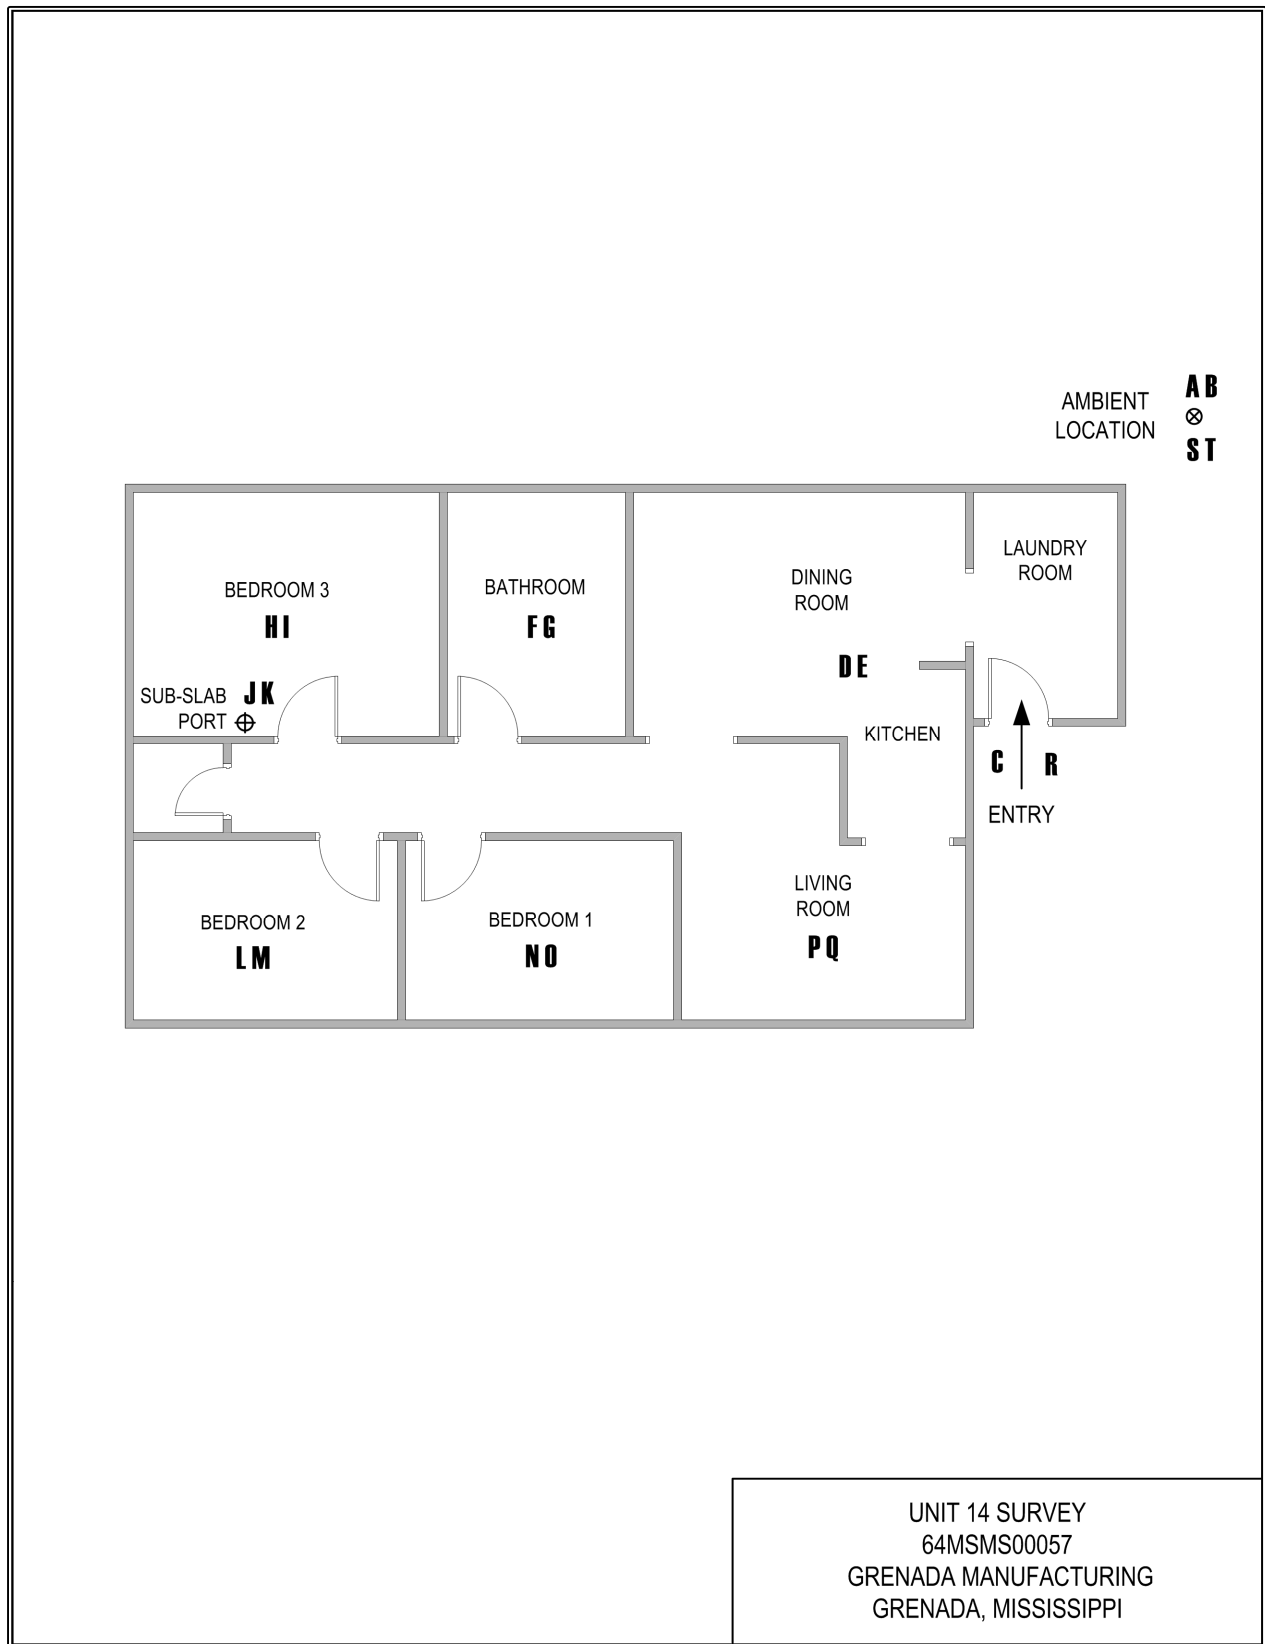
Unit 14 Survey Floor Plan, 64MSMS00057
